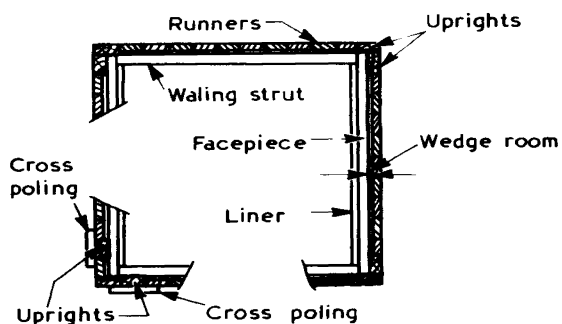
Trench timbering for quay walls, etc. (see 14.9.2)
